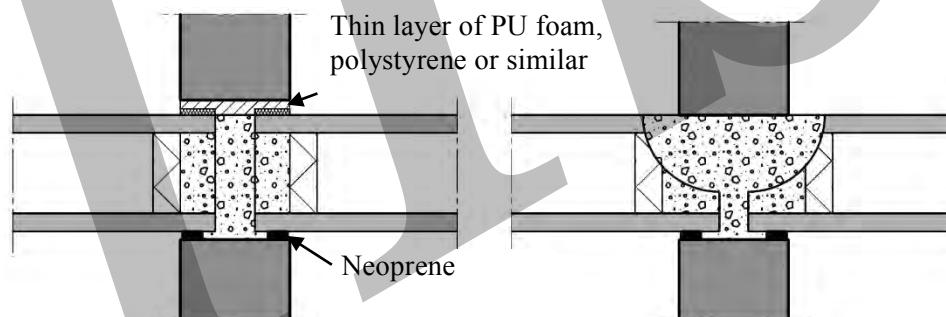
Measures to limit or avoid restraint moment at the support connection of hollow core elements, a. use of a soft fill, b. slanted ends
